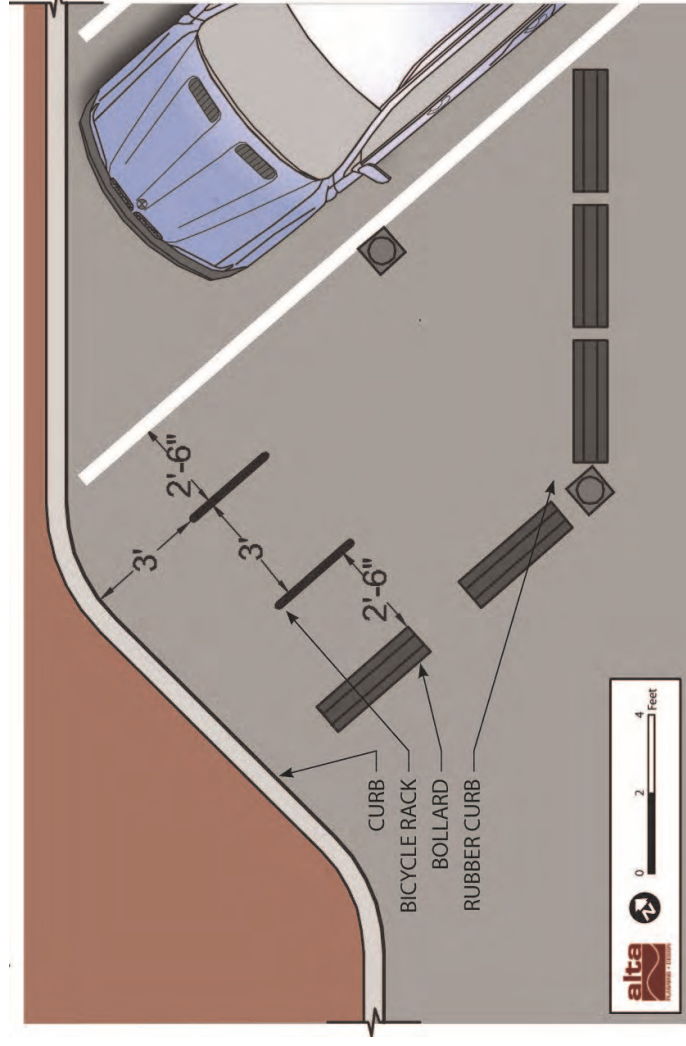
3rd Avenue and San Mateo Drive Bicycle Parking Plan View
